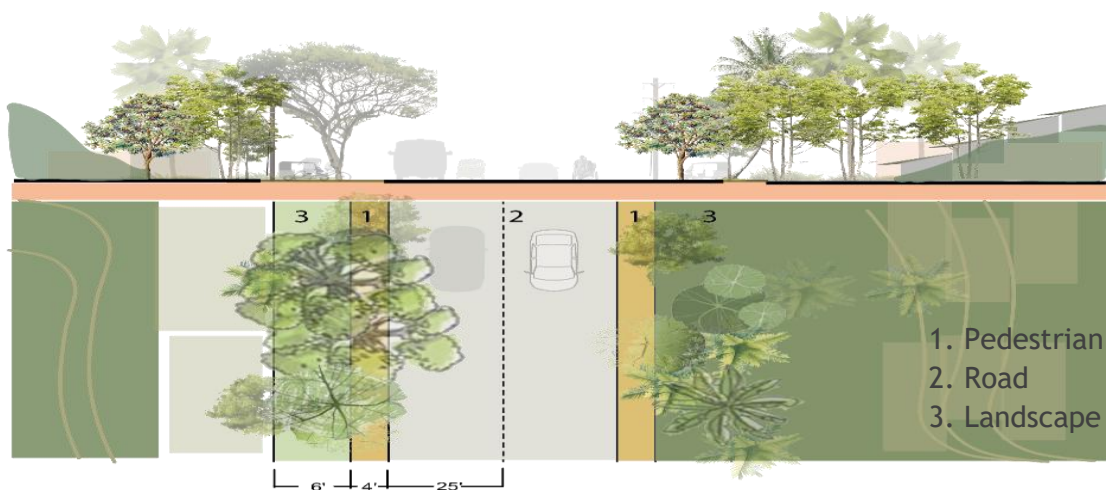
Tilagarh street analysis (section; plant profile: chart4)(author).
